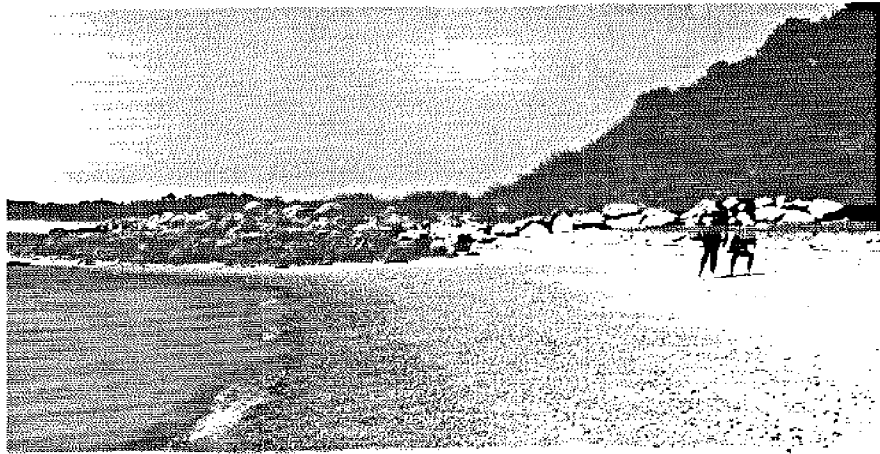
Sta. VIII. Groin 2, looking southwest, and the point of land it is protecting.
